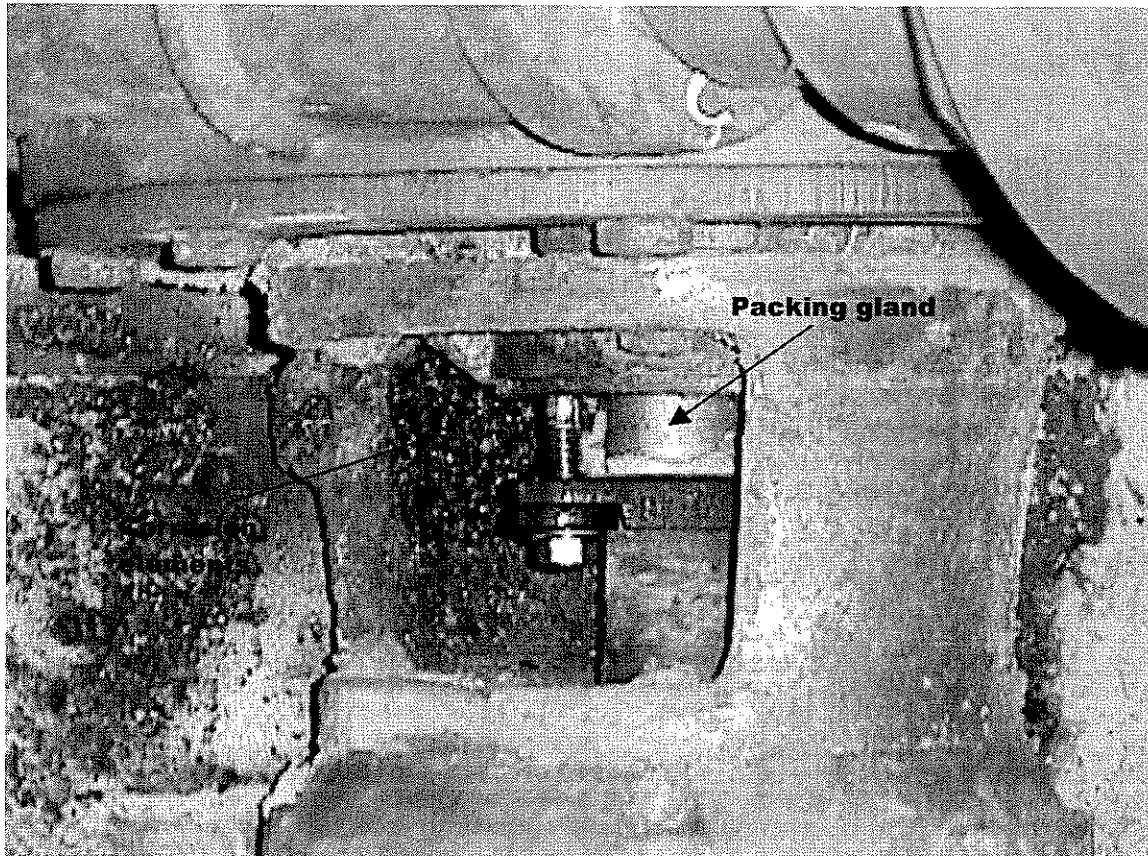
Close-up of pump packing gland that has been leaking and causing corrosion – probably salvageable.
